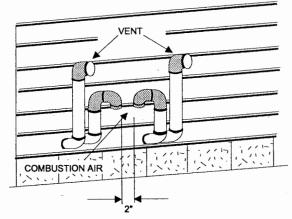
DOUBLE SIDEWALL TERMINATION
